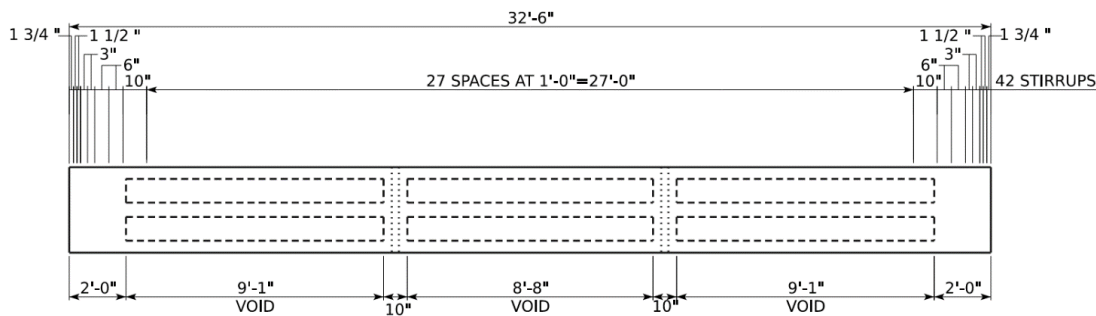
Plan view of the experimentally tested prestressed concrete box beam.
